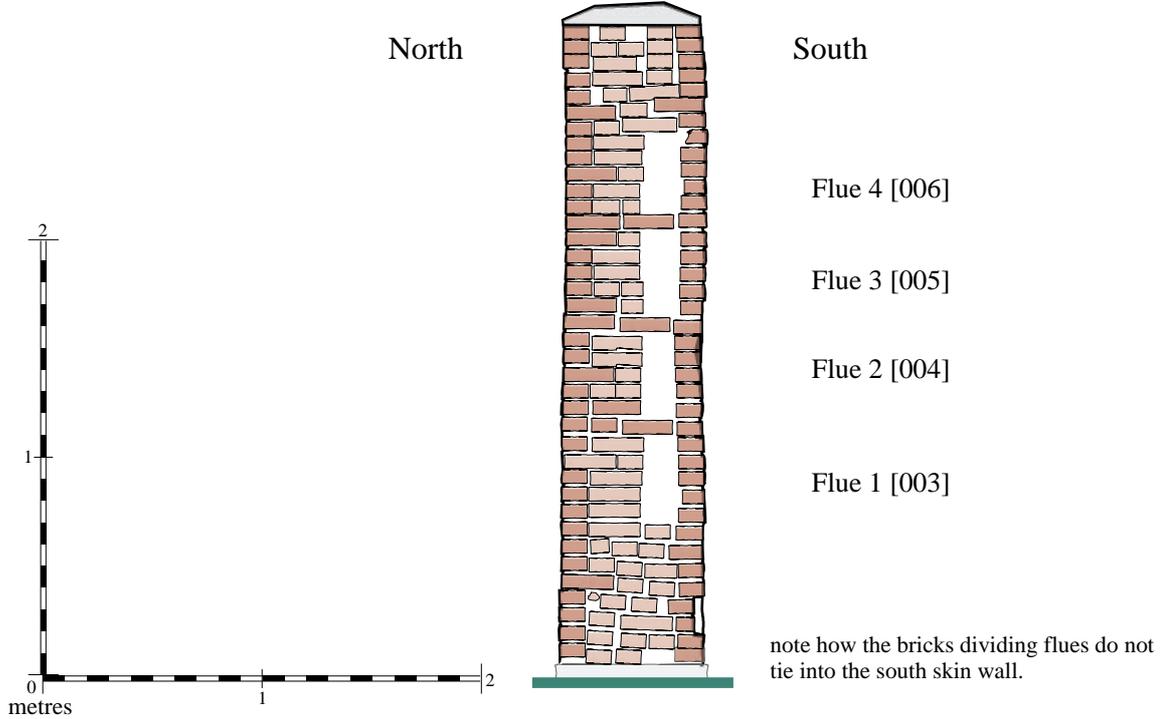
Cross section of Wall [001] showing flues and possible phased construction of wall.
